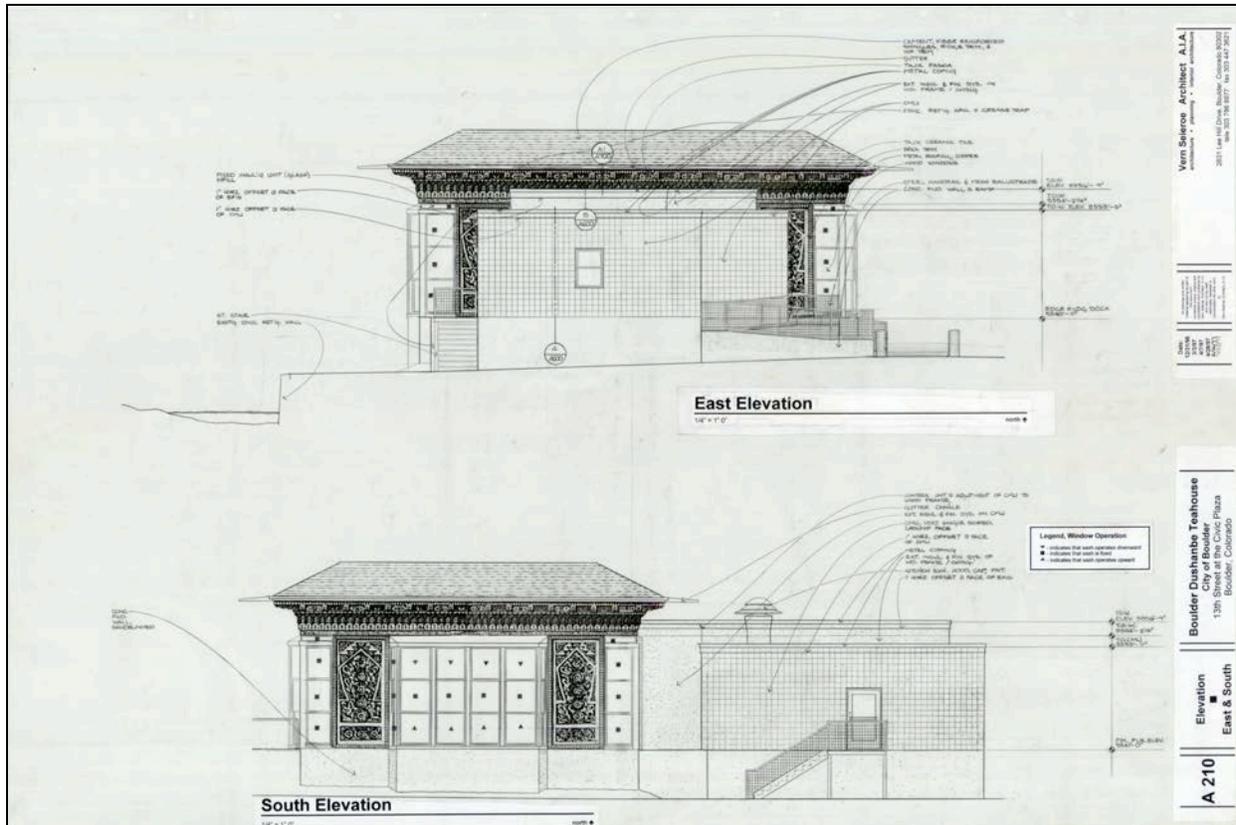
Construction Drawing A210, East and South Elevations, Vern Seieroe, AIA, Architect
